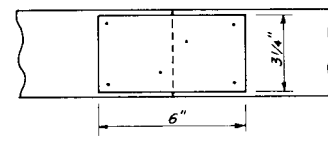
Joint details for toothed metal plate trussed rafters. Plates were 18-gage galvanized sheet metal with 3/4-inch-long teeth. (M134835)
